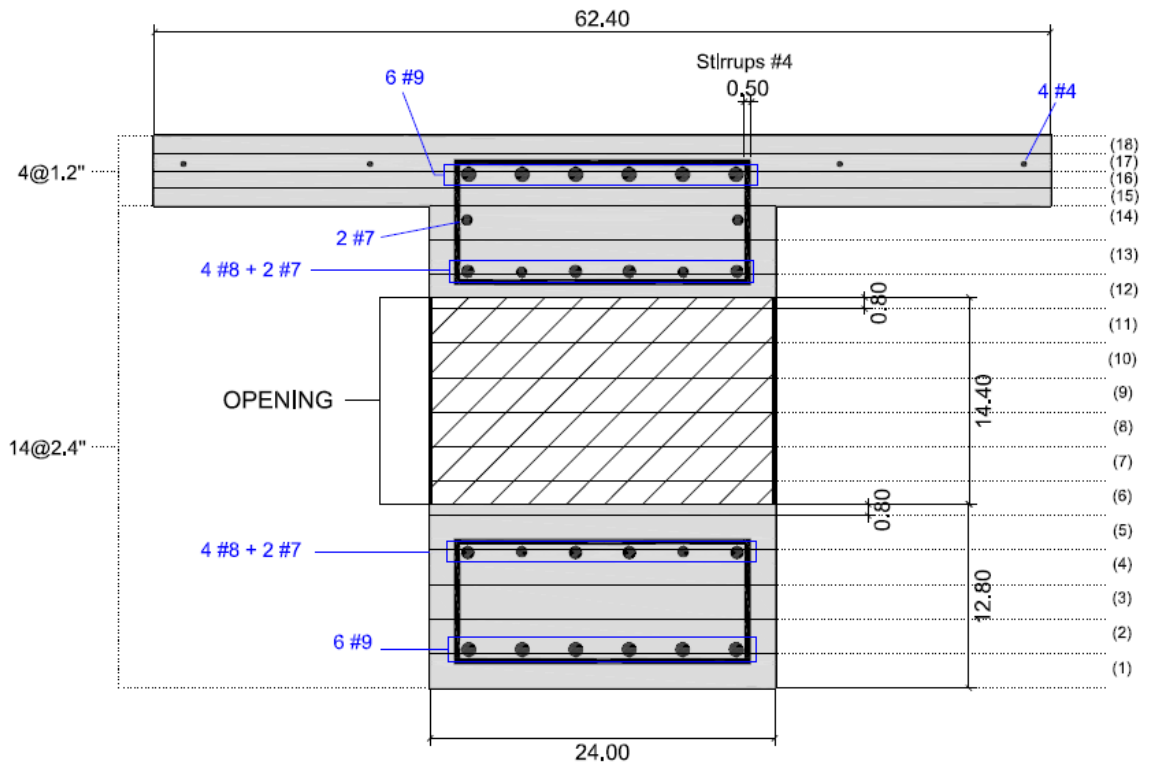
Cross section 5 for Specimen 1. Dimensions in inches.
